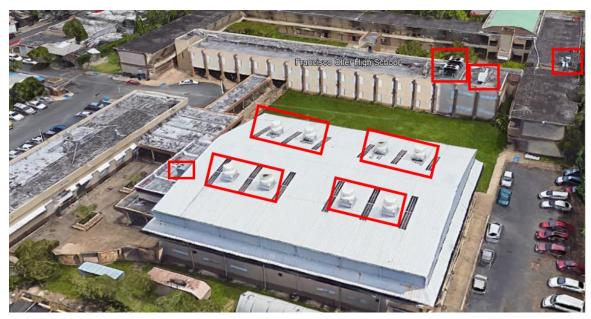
Nonstructural Falling Hazards at Francisco Oller School (Google Earth – 2016)
